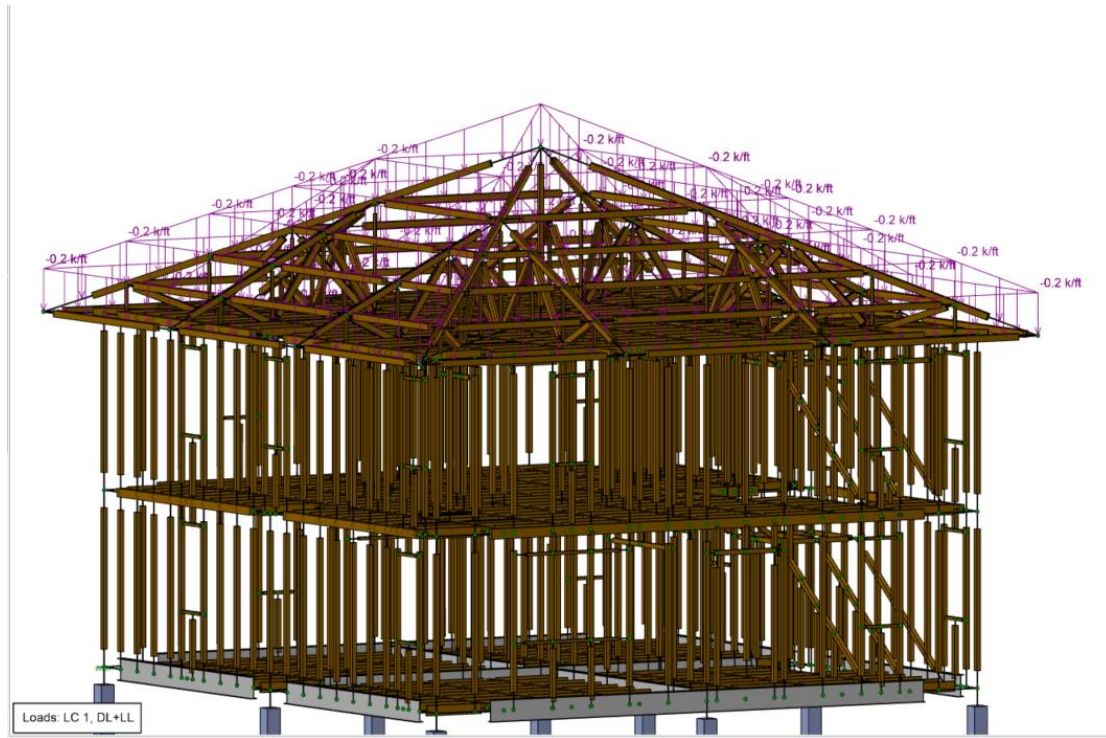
Load combination of the structure, mainly the live load acting on roof trusses.
